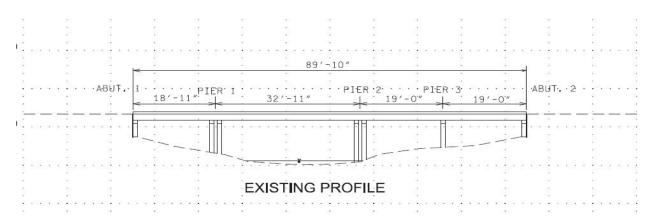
Existing Bridge Profile of SR-436 over Reedy Creek in the 03/22/2018 TIR.
